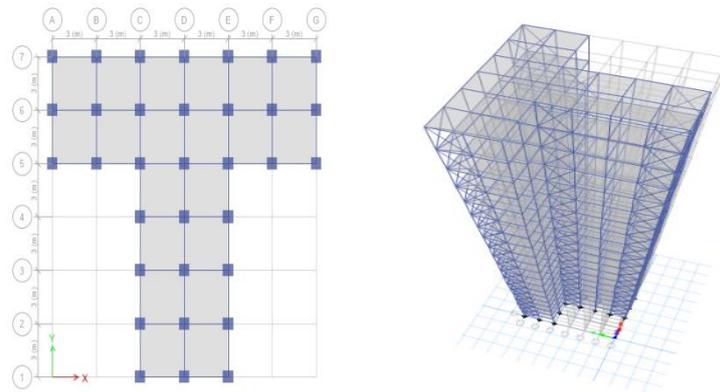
a)Plan of Moment Resisting Frame C-Section building
